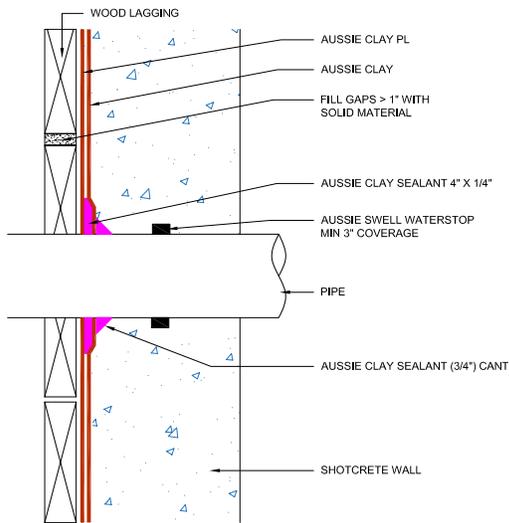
PIPE PENETRATION IN HYDROSTATIC SHOTCRETE CONDITION
